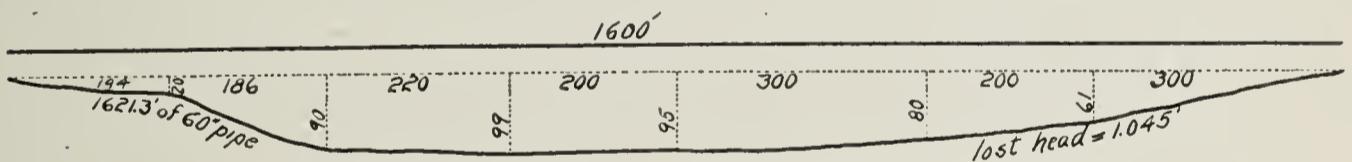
Siphon No. 14, Arkansas Valley Conduit, Pueblo.
